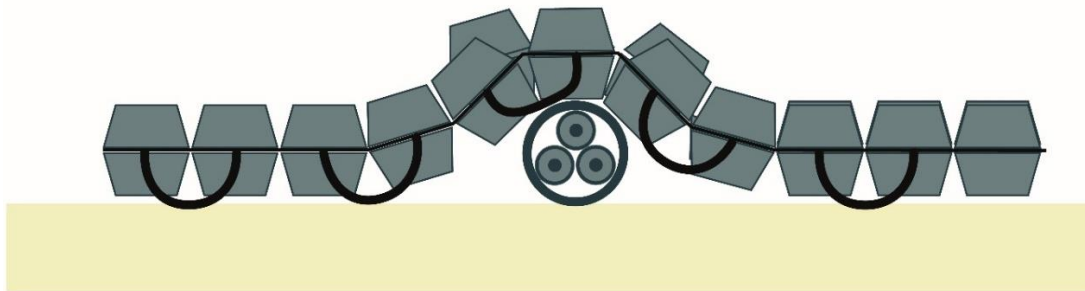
Cable Protection, Concrete Mattress Cross Section
